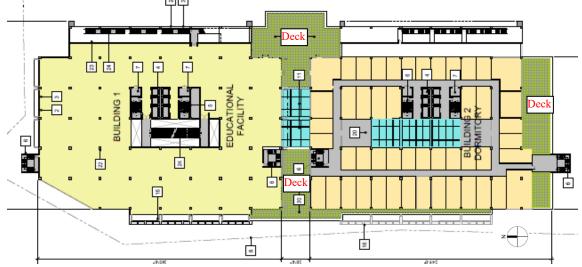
8th Floor Roof Top Deck Buildings 1 and 2
